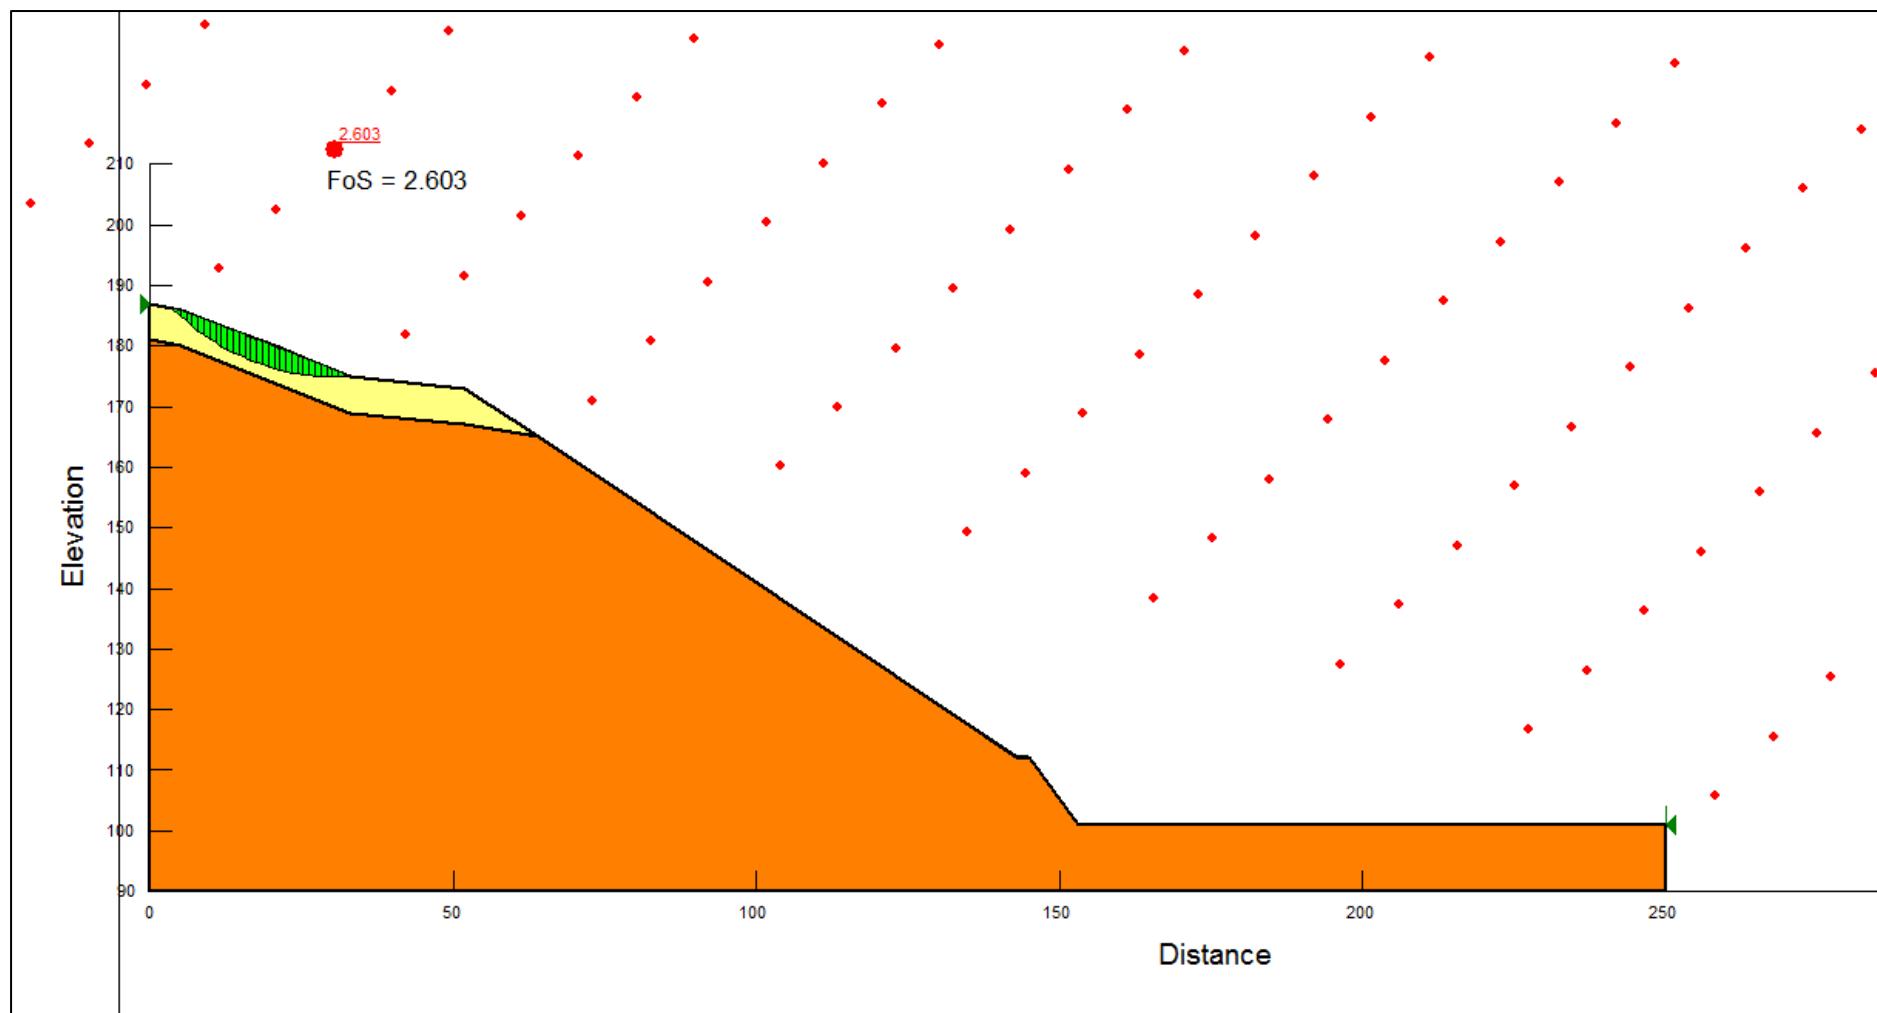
E.13: Outlet portal, Section 1, 1:1.5 excavation slope
